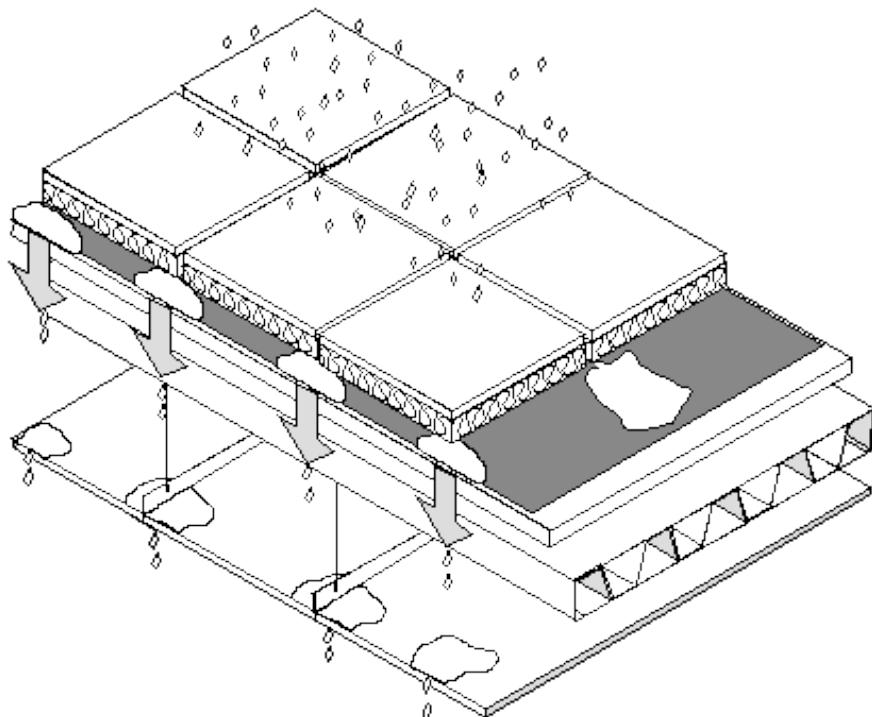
Thermal bridges caused by rainwater percolating between slabs of insulation on an inverted roof over a lightweight deck can lead to condensation on the ceiling beneath
